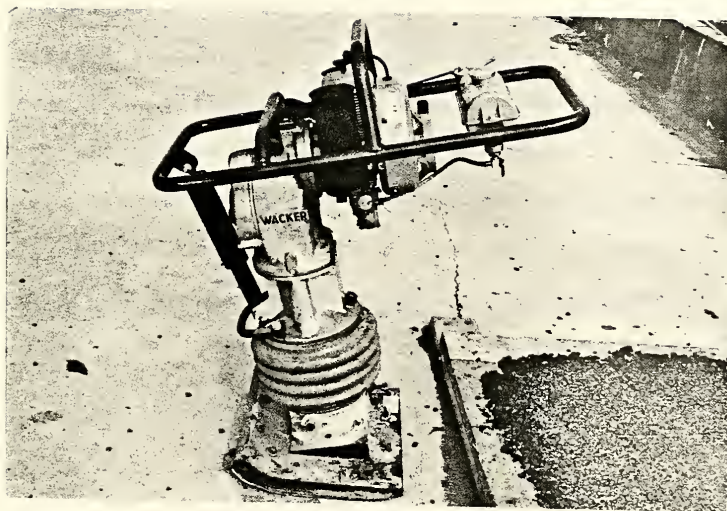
Example of a Mechanical Compactor Used for Large Area Patches.
